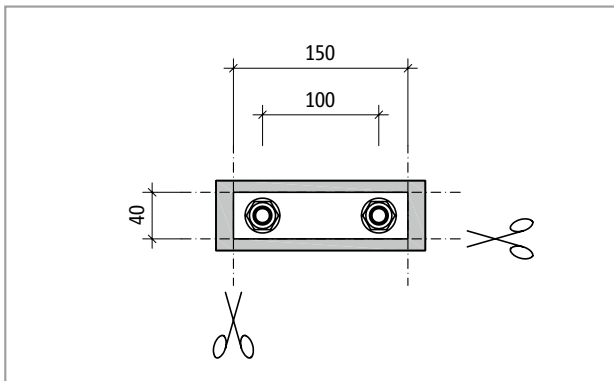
Schöck Isokorb® T type S-N: Dimensions according to cutting of insulating element
